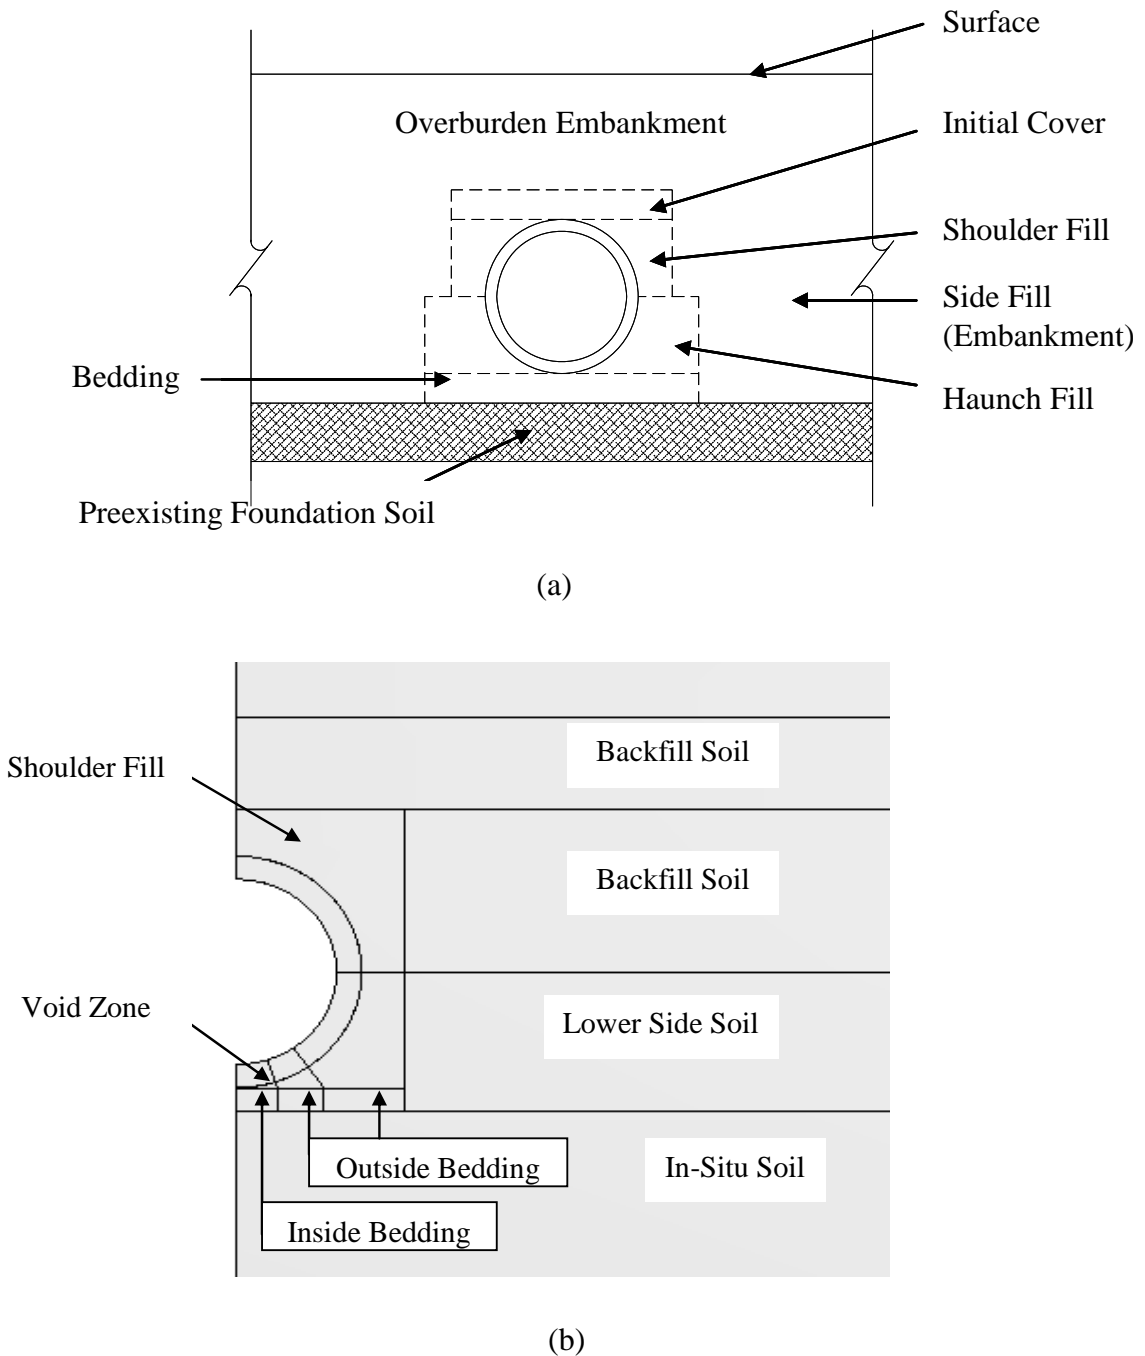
Embankment Installation (Positive Projection); (a) Typical details and (b) Soil zones used in the symmetric FEM model
